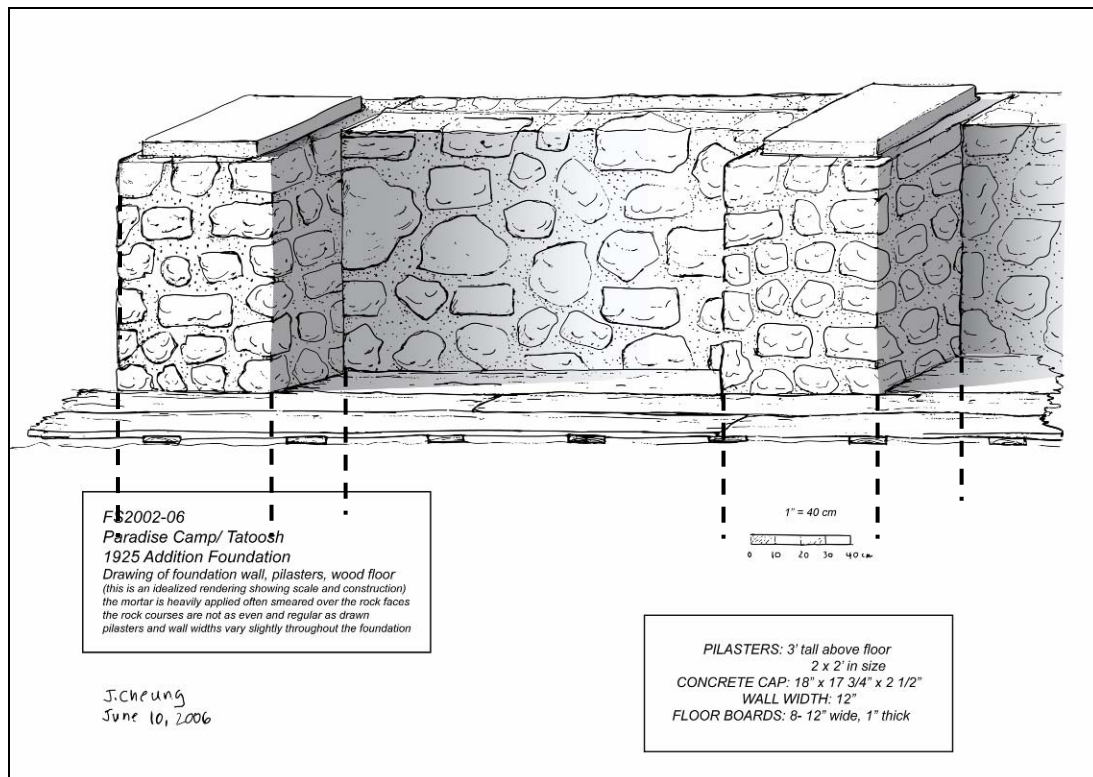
Stem Wall, Pilaster and Plank Floor Construction Detail.
